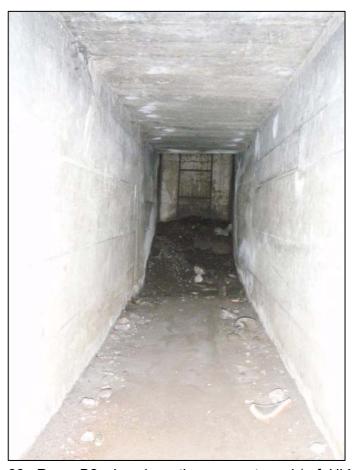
Room B2, view down the escape tunnel (ref. HLX 83)
